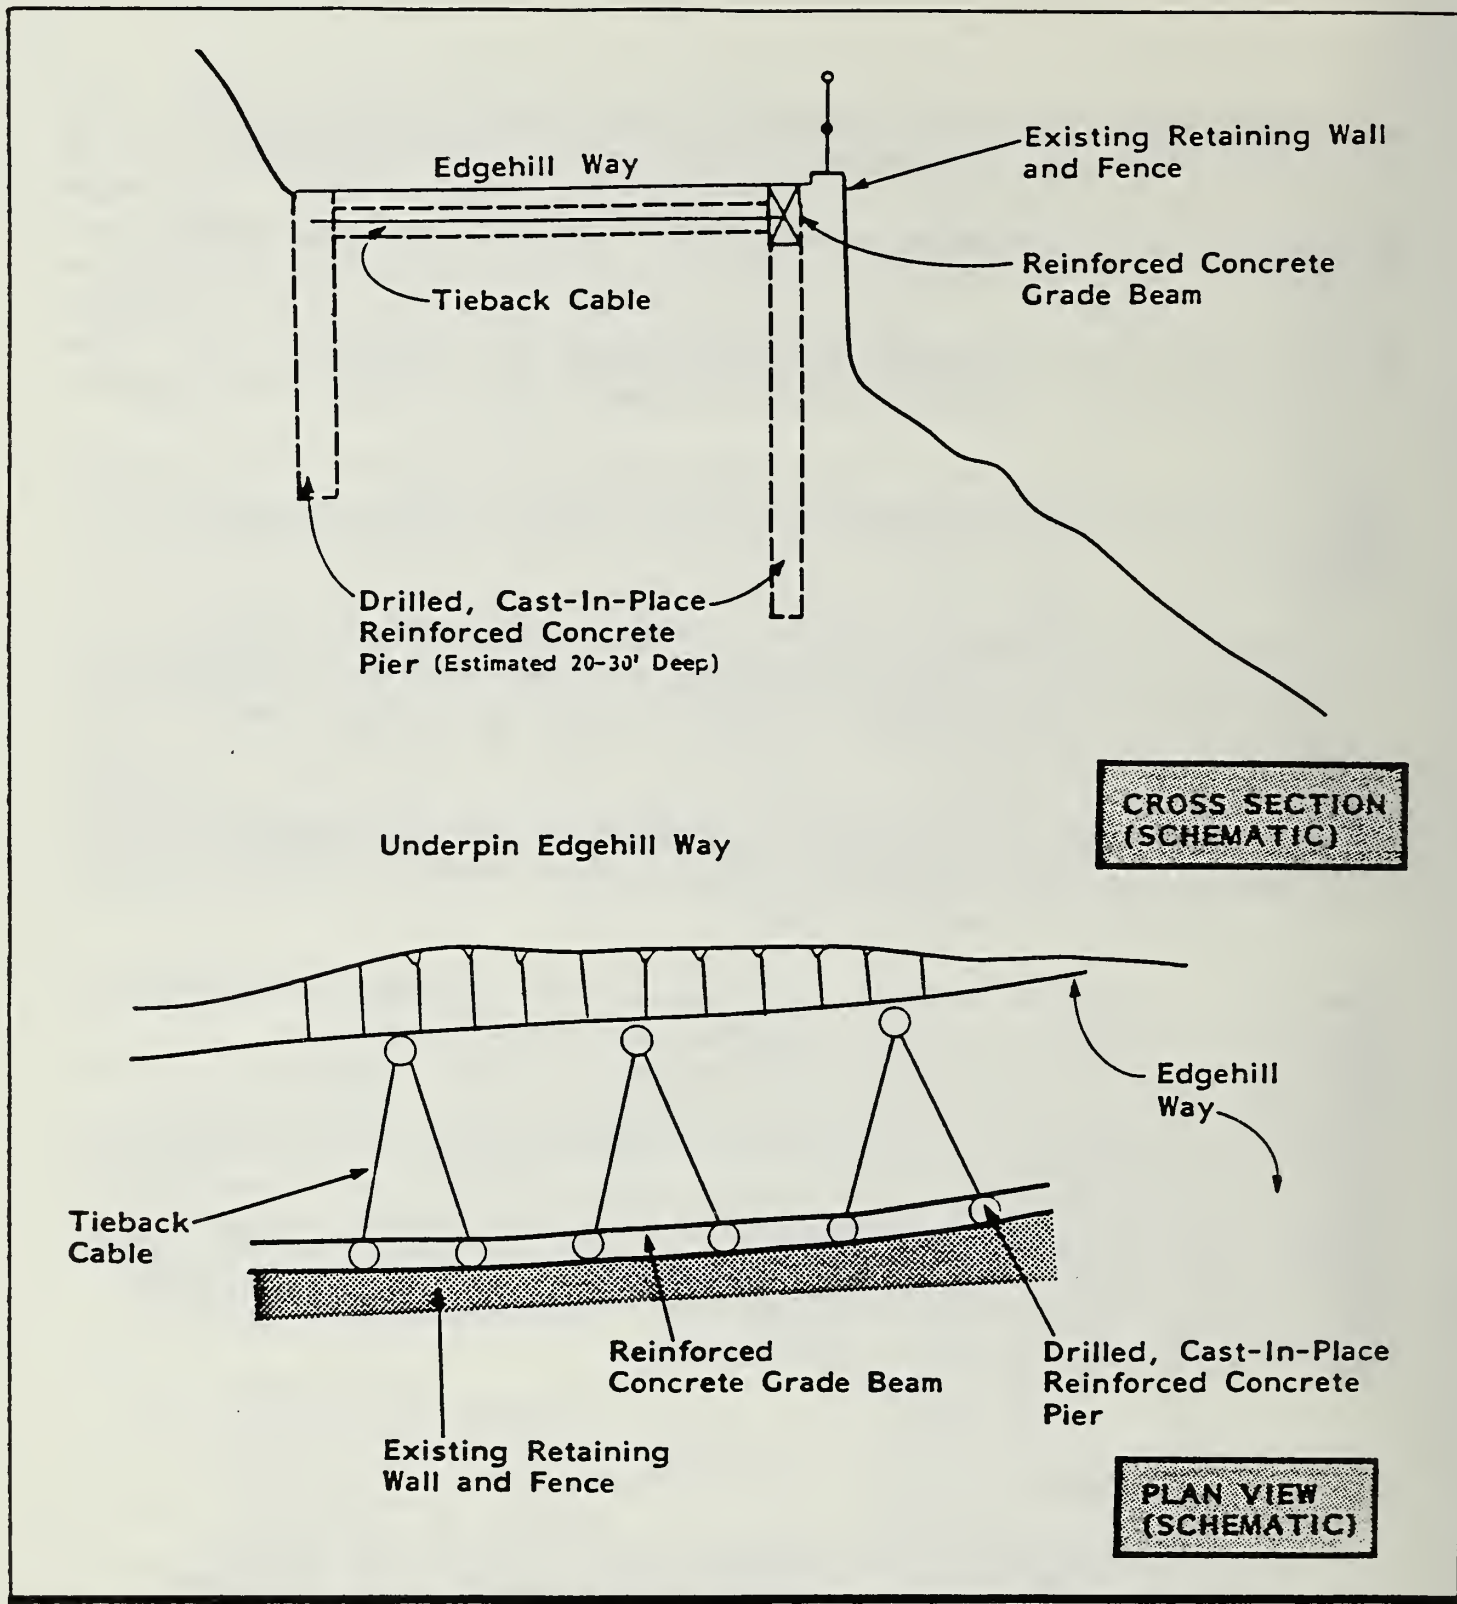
SCHEMATIC SKETCH -- UNDERPIN EDGEHILL WAY
